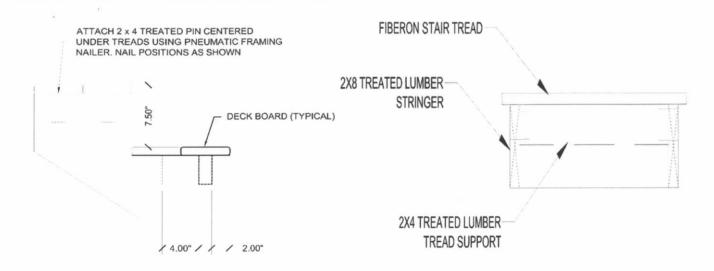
Fiberon Paramount® and Promenade PVC Stair Tread Installation
